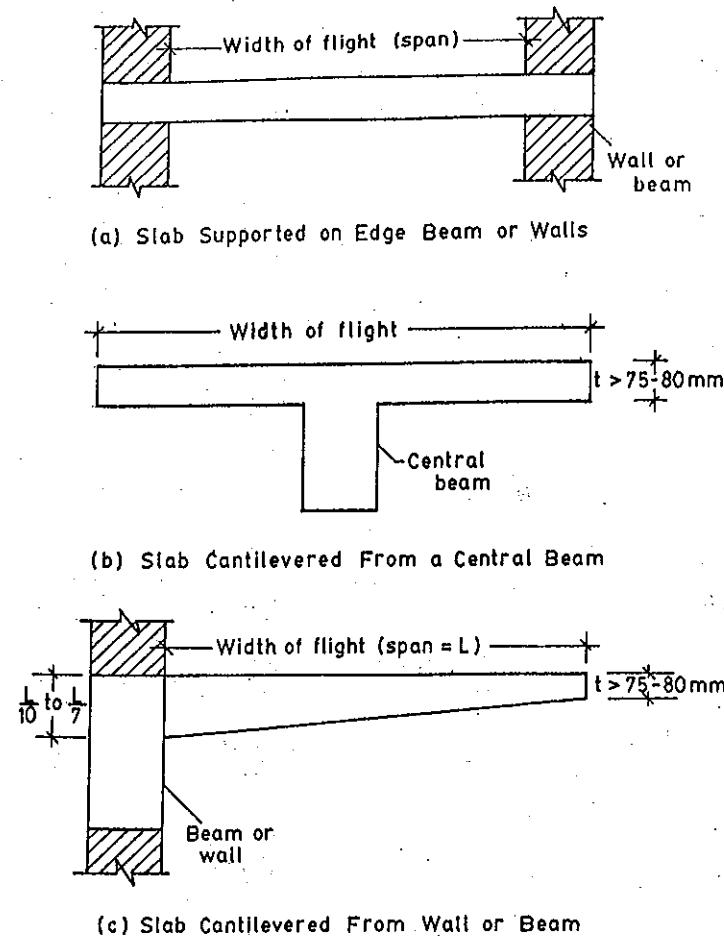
Staircase Slabs Spanning in the Transverse Direction
